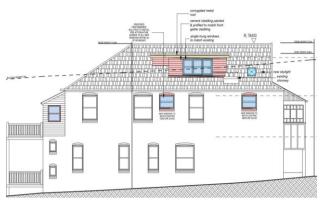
Proposed North Elevation detailing new windows to the first floor of 35 Murdoch Street
